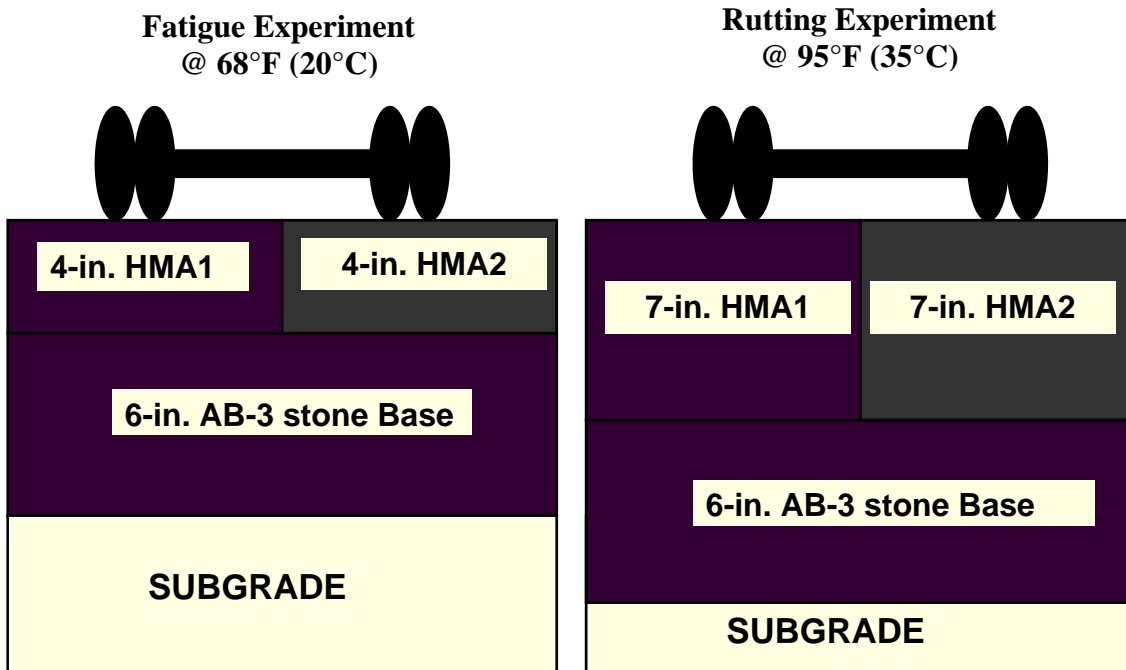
Cross Section of the Experimental Pavement Sections
